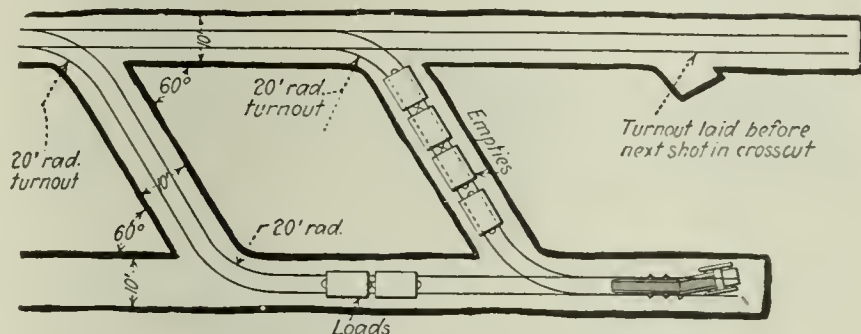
PLATE II. TRACK LAYOUT FOR ENTRY DRIVING
